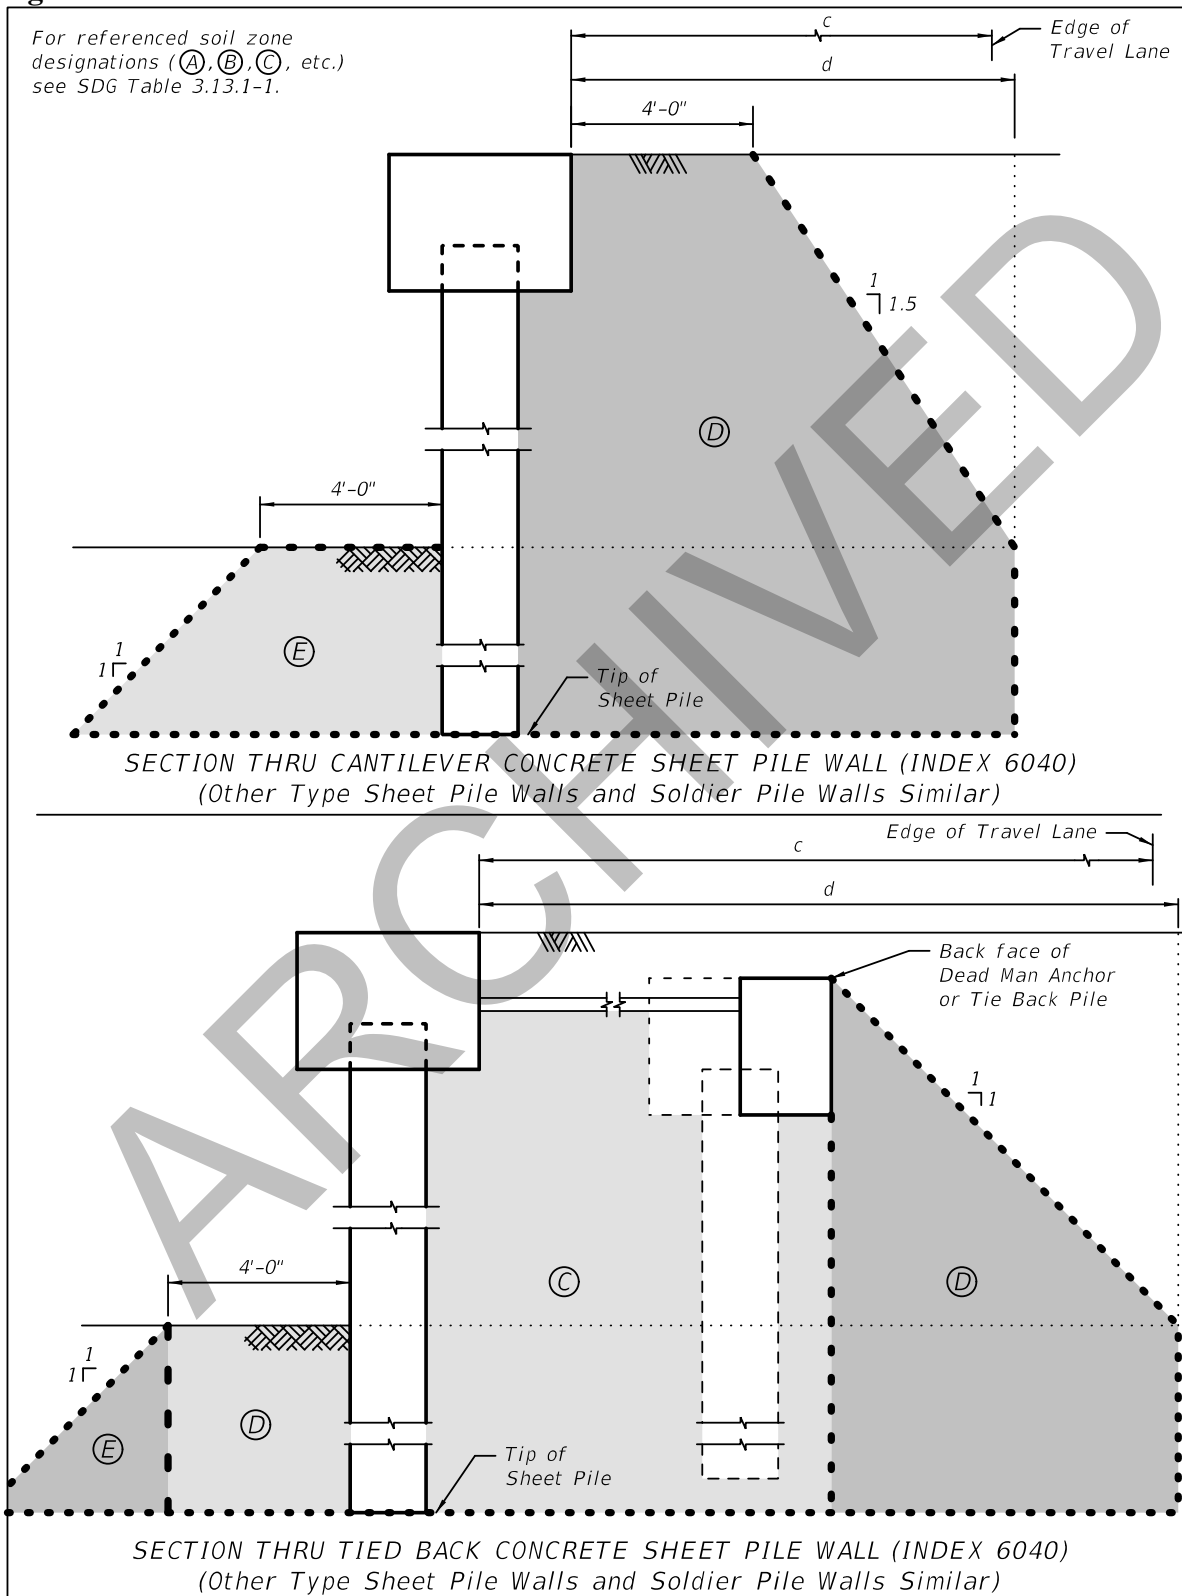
Permanent Sheet Pile Wall and Soldier Pile Wall Soil Zone Details
